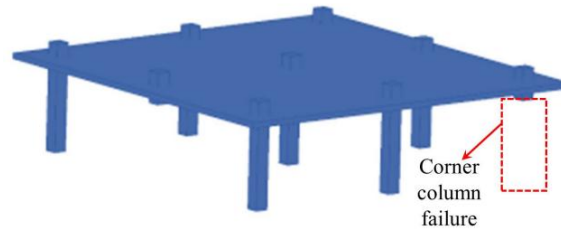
Separate model for reinforced concrete flat slab–column structures.
